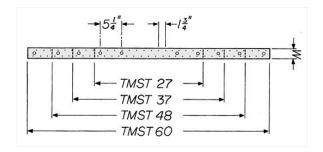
D—DRAWING SHOWING THE RELATIVE LENGTHS OF THE TMST STRAPS (TMST72 similar; TSI similar, but without bolt holes)
